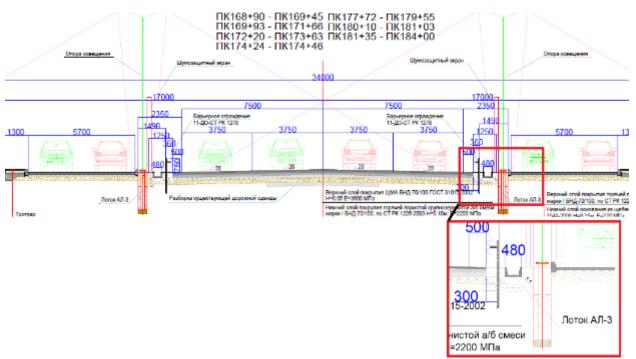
Detail (guardrails, drainage tray, noise barrier and lighting pole)
